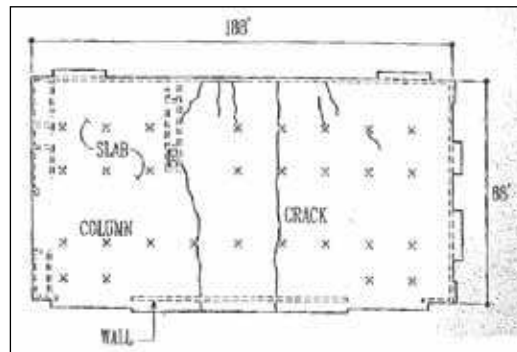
Crack pattern for prestressed slab with unfavourably placed walls
